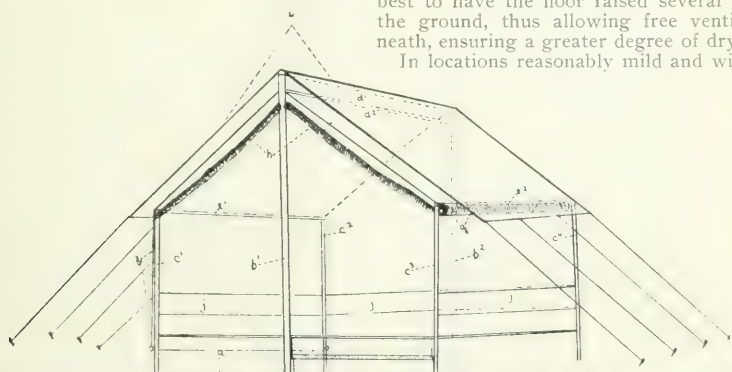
Tent type showing: a, elevation from ground to floor; b, b', centre poles; c', c', c', corner uprights; d, d', ridge poles; e, e', cross-pieces from corner uprights; f, right wall lowered; g, left wall rolled up; h, front flaps rolled up; i, fly; j, boarded sides two feet high.
